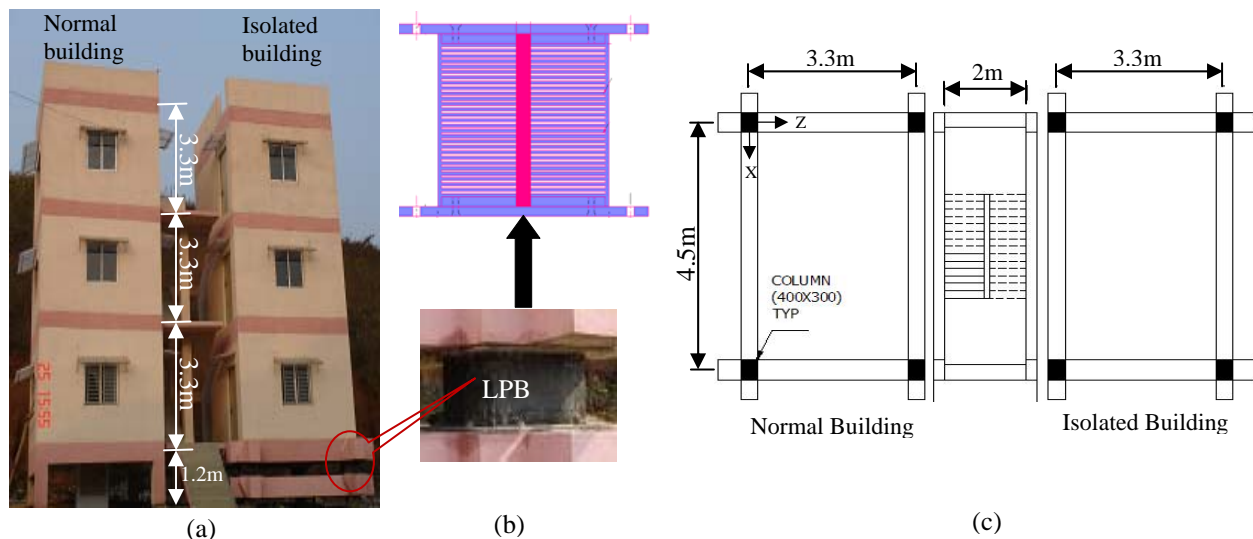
(a) Experimental buildings at IIT, Guwahati; (b) Lead plug bearing (c) Plan view of the buildings
